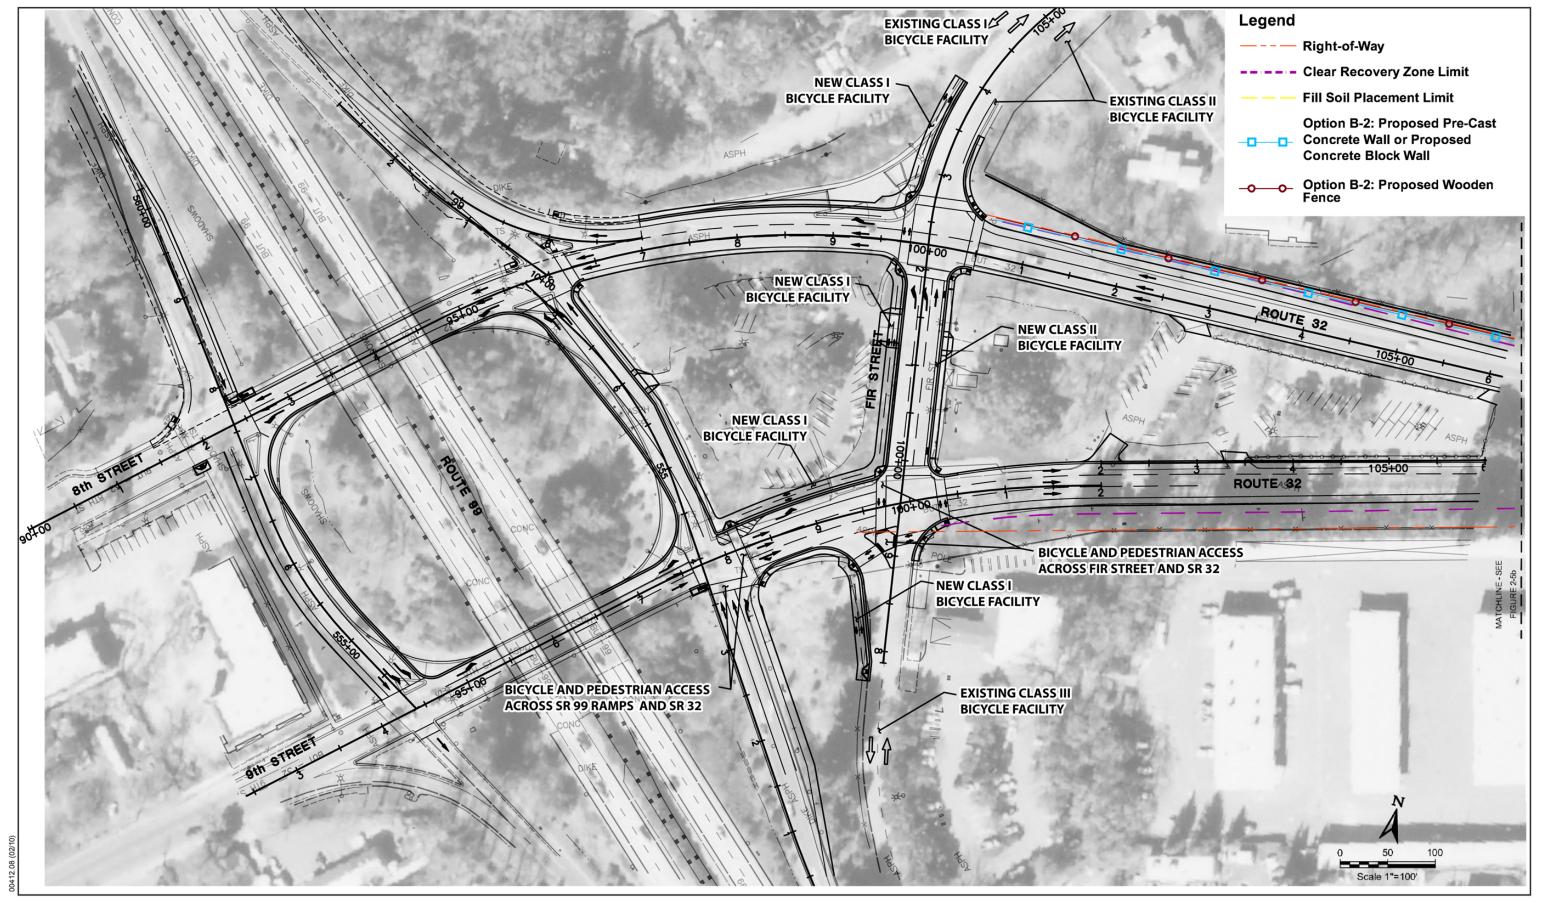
Timber Barrier Alternative, including Proposed Sound Barrier
